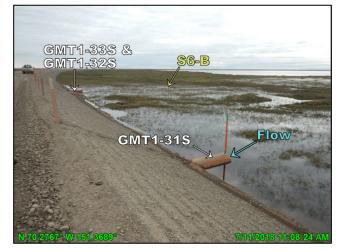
S6 gages and culverts, looking southeast; July 11, 2018
